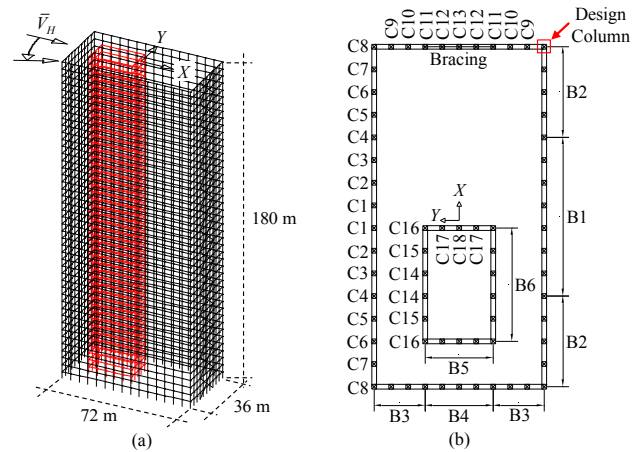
(a) 3D view of the 45-story building; (b) structural layout of the building showing beam and column assignments and the critical column.
